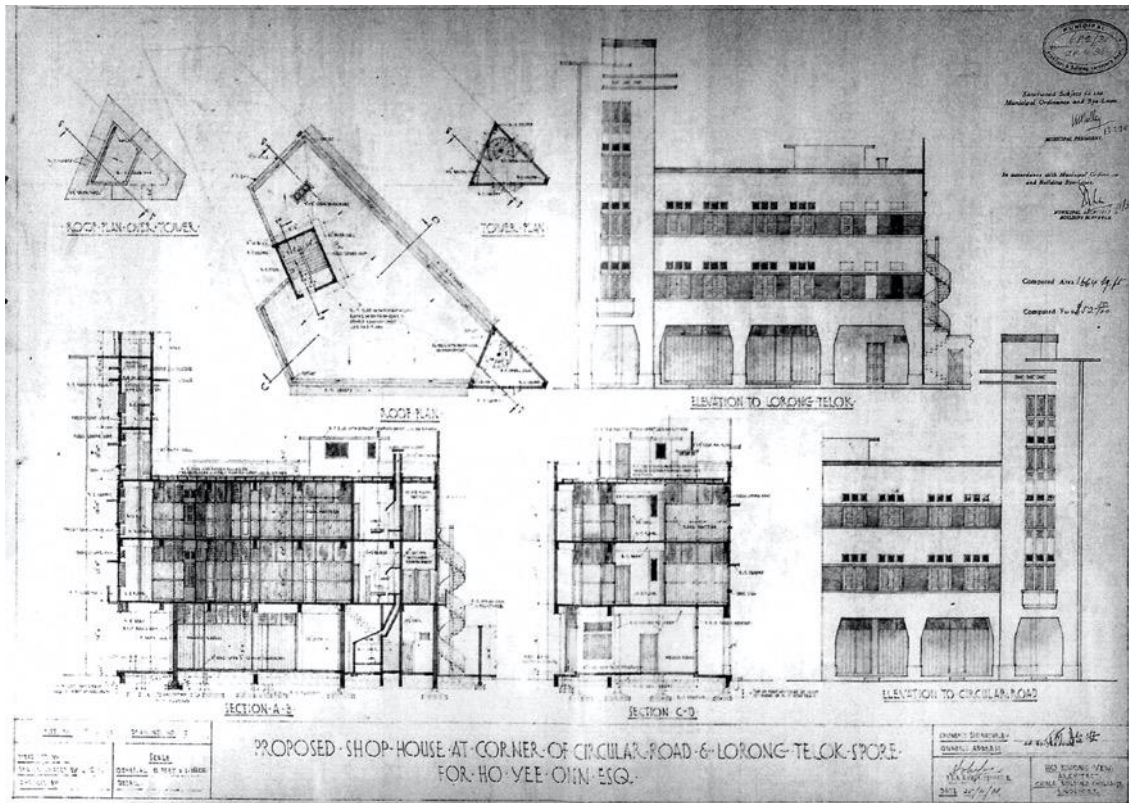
Ho Kwong Yew. *Shophouse at Lorong Telok, Singapore for Ho Yee Onn, 1938.* NAS CBS 78, Building Plan 682.
